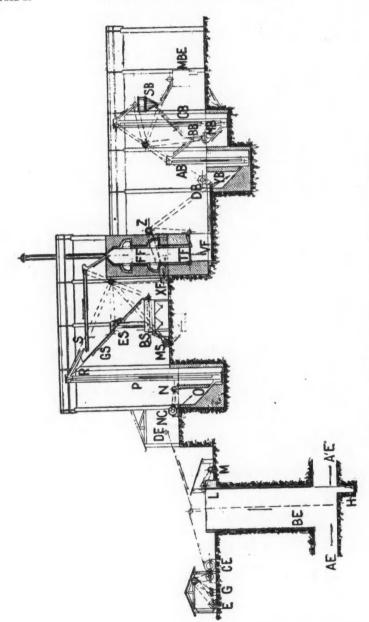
,-Arrangement of Plant at Factory for Manufacturing Plaster,
